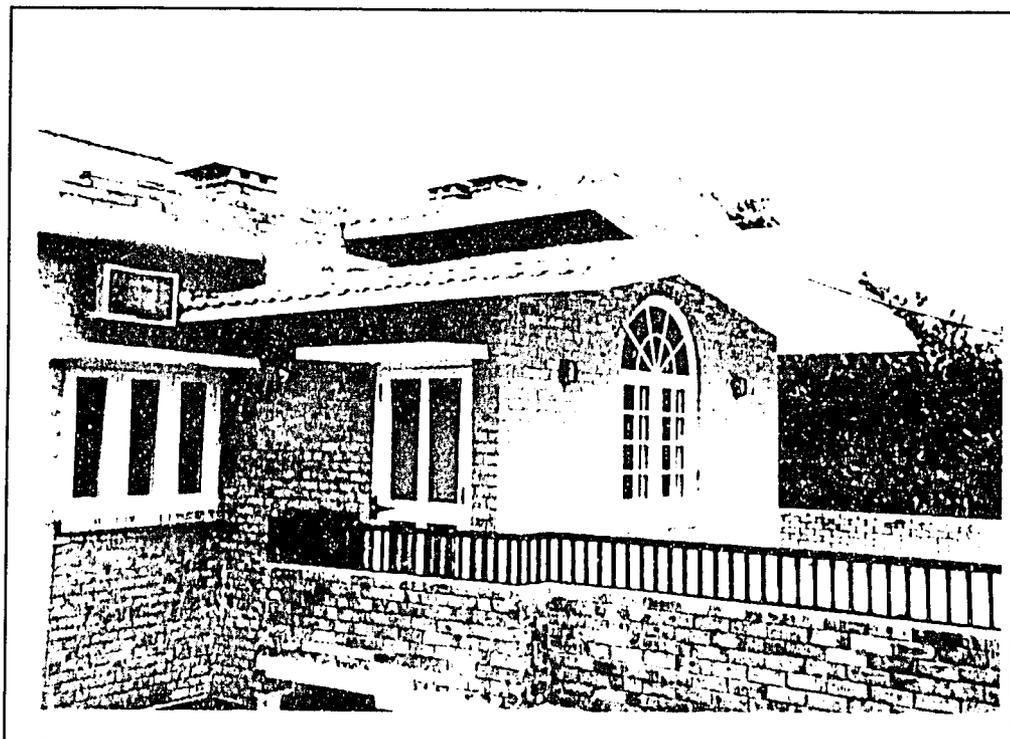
Peshawar CCSC Headquarters Building. View of Building #3 from Building #4.
